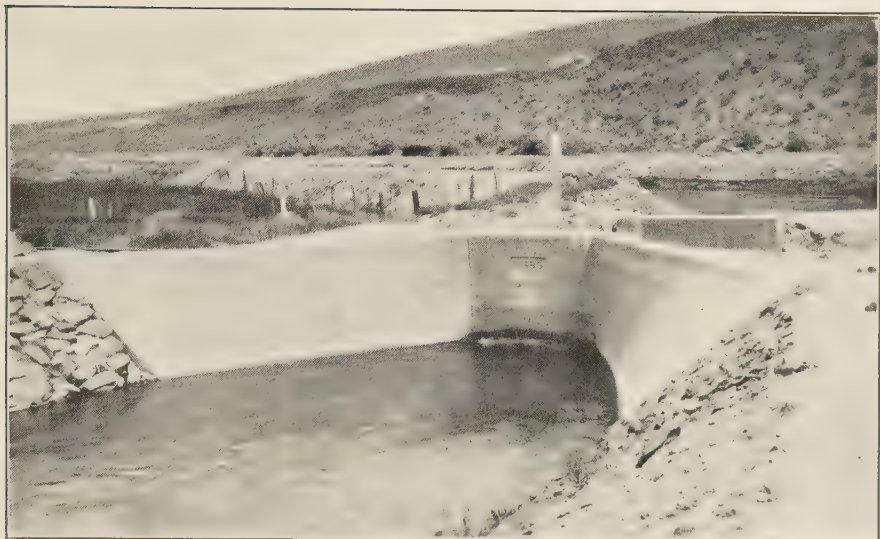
FIG. A.—Box culvert for railroad crossing. Umatilla Project, Ore.
